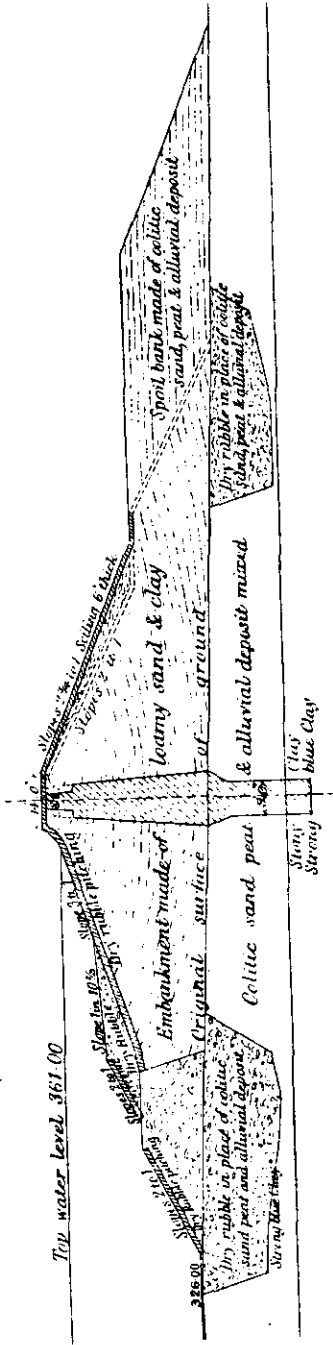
Transverse section of main embankment as constructed after (Fox, 1898)
